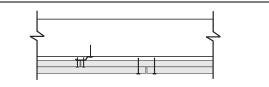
B.(b) Double Layer Butt Joint Details
